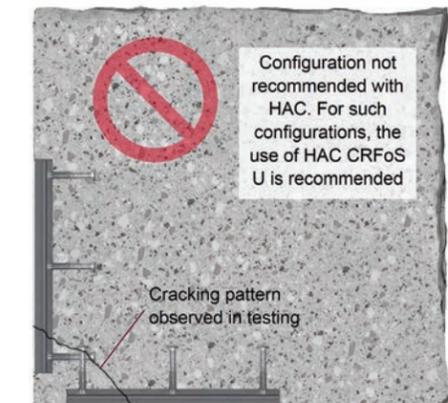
Premature concrete cracking due to simultaneous loading of pair HAC-T at corner with overlapped anchors, plan view.
